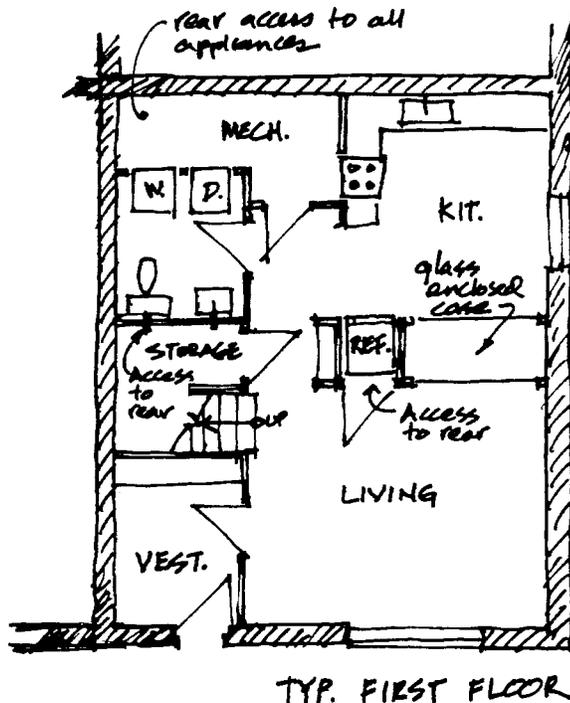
Barhaven Community Housing, typical unit plan, first floor.
